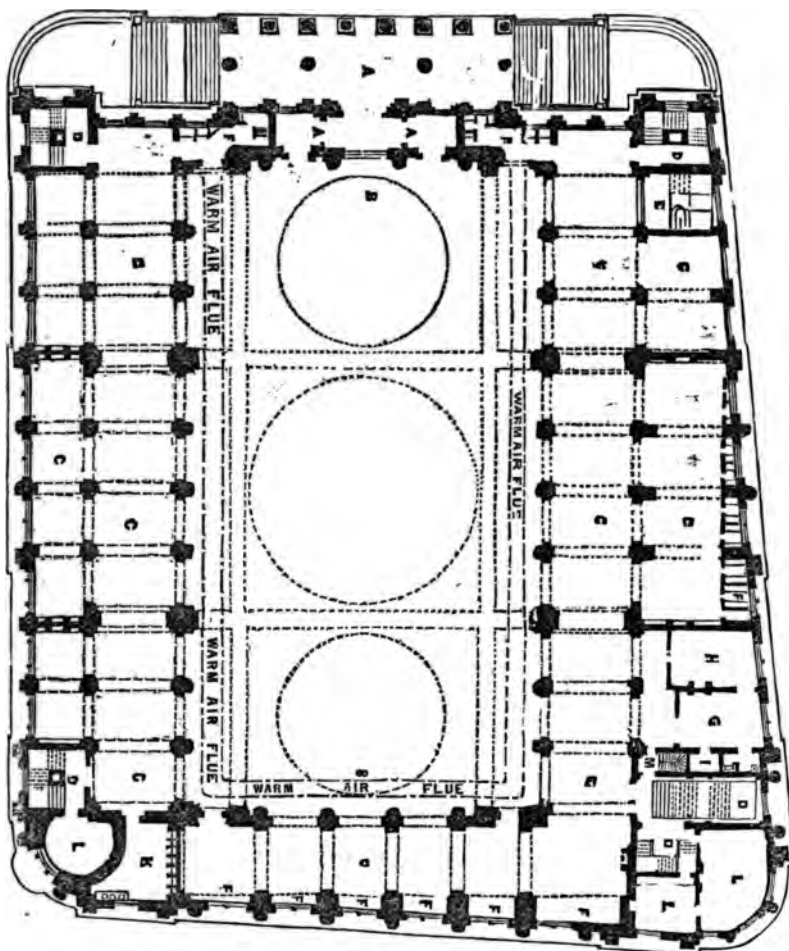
PLAN OF ROYAL EXCHANGE.
